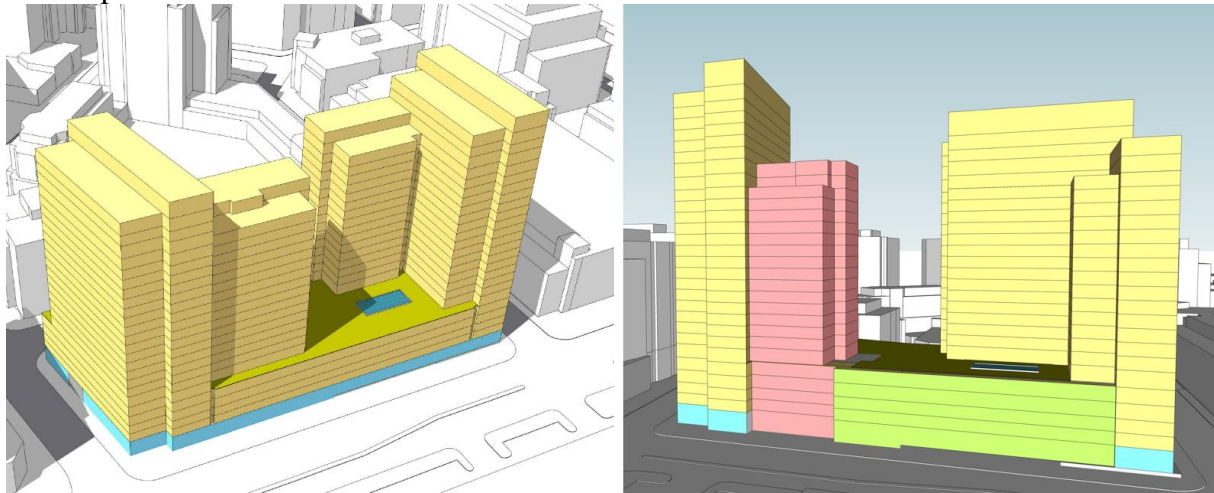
The Applicant worked with Staff and the DRB over multiple iterations to refine the massing of the towers to achieve the Plan’s desire for a “signature façade” on Eisenhower and Mill
